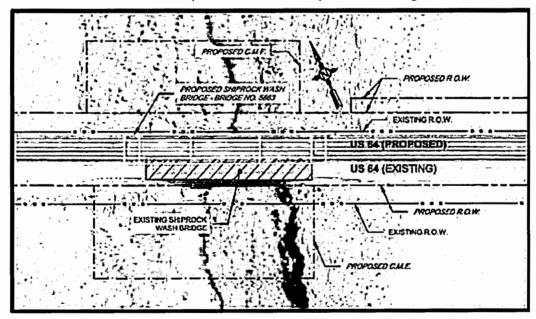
Proposed Plan View of Shiprock Wash Bridge
